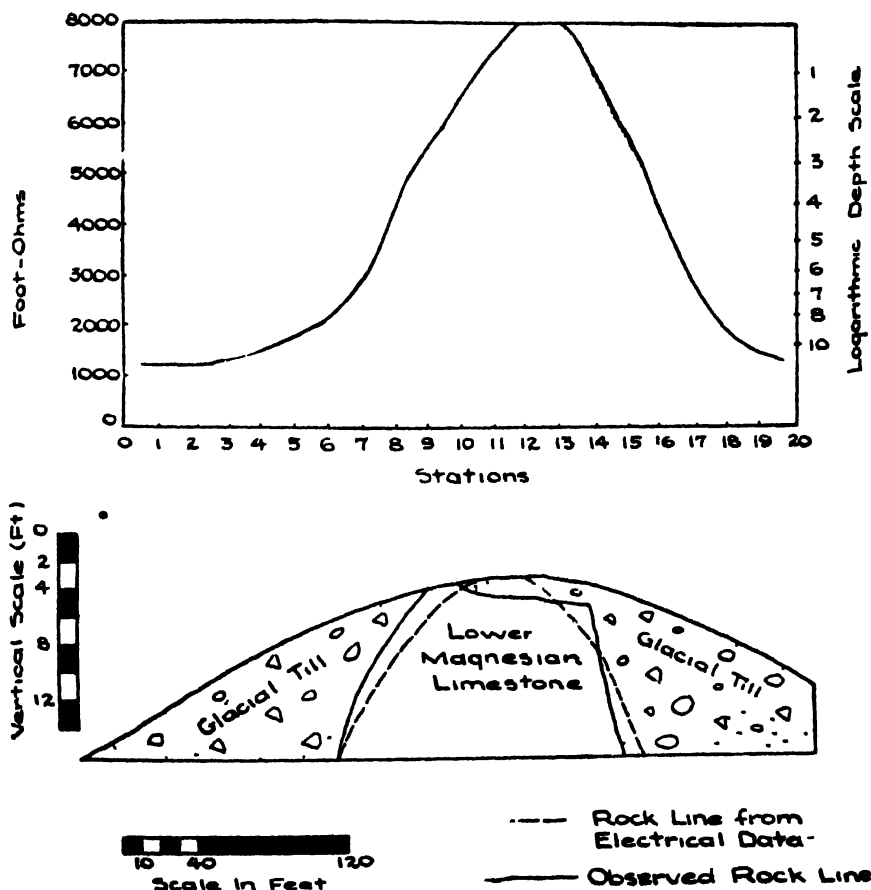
Determination of rock excavation in a projected highway cut through a till mantle hill. (After Kurtenacker, courtesy of the AIME)
